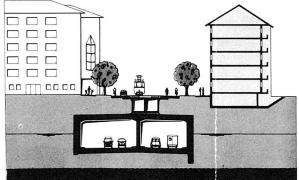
Tunnel 'Horburg West': Typical Cross Section
